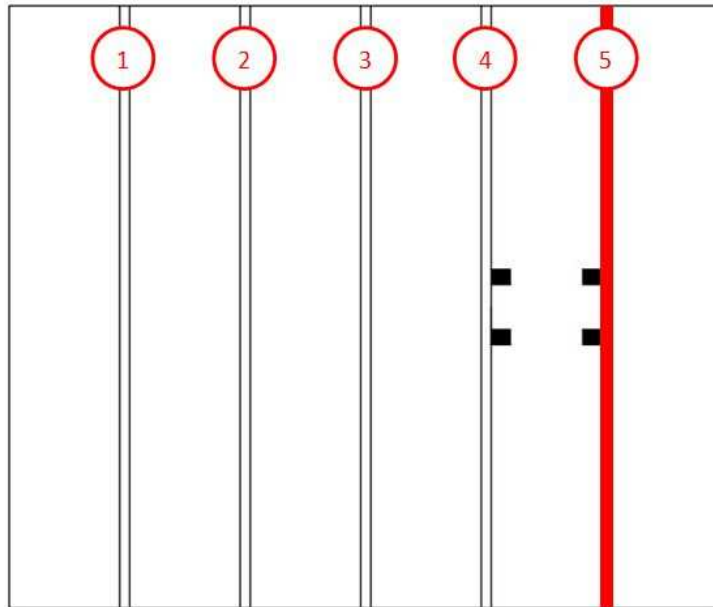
Critical load location for shear for an eight-foot section NEXT-D bridge
